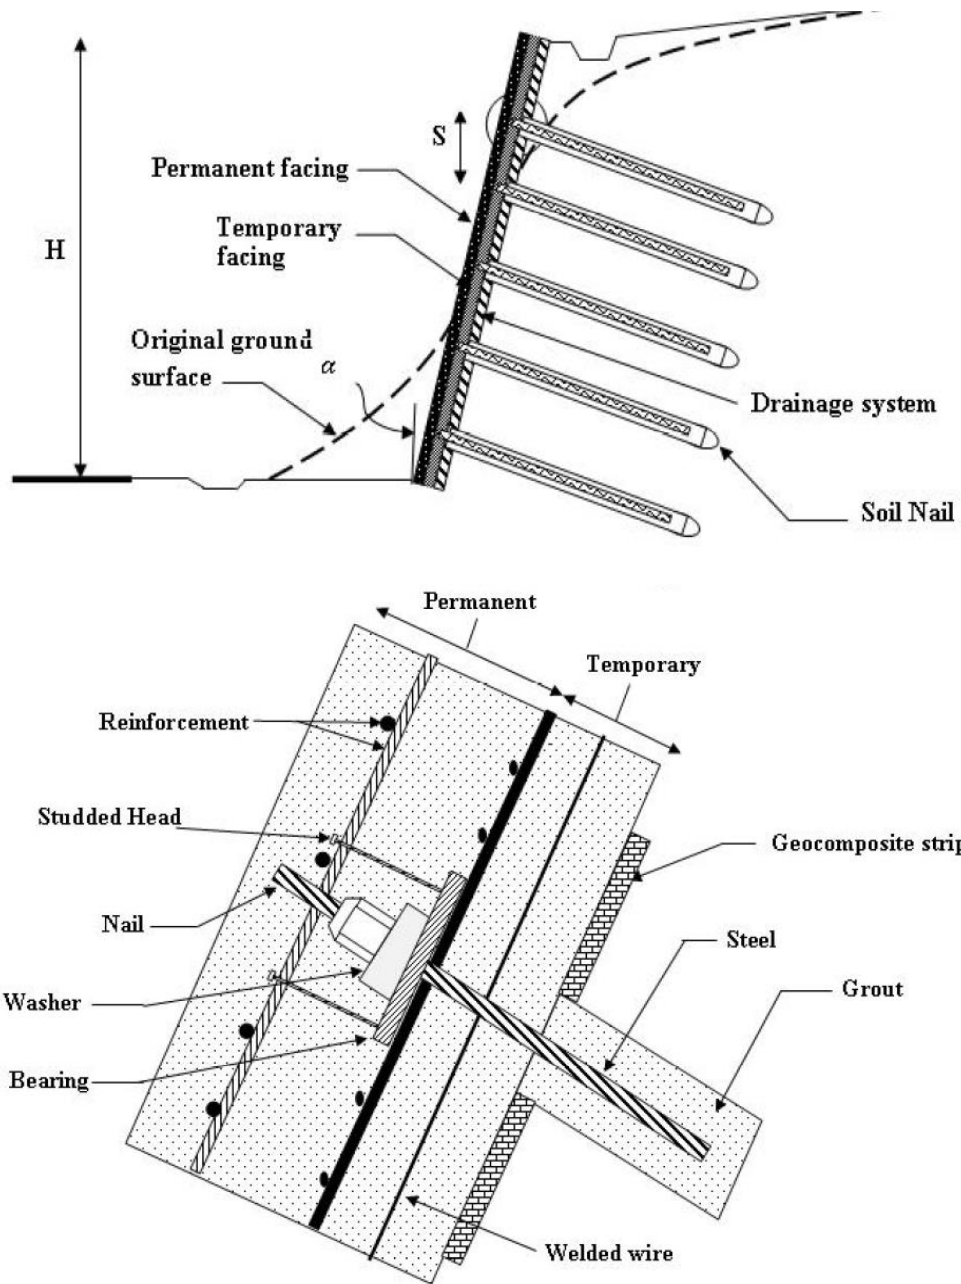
Typical cross-section of a drilled soil nail wall ([www.rdso.indianrailways.gov.in](http://www.rdso.indianrailways.gov.in))
